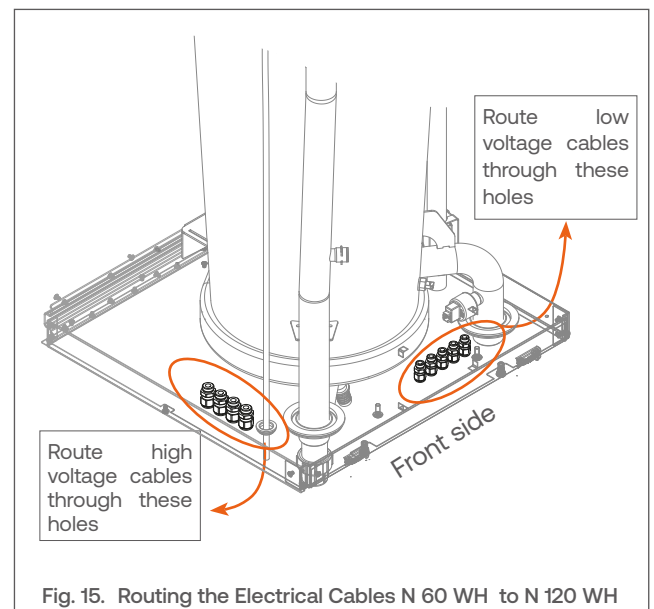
Routing the Electrical Cables N 60 WH to N 120 WH
